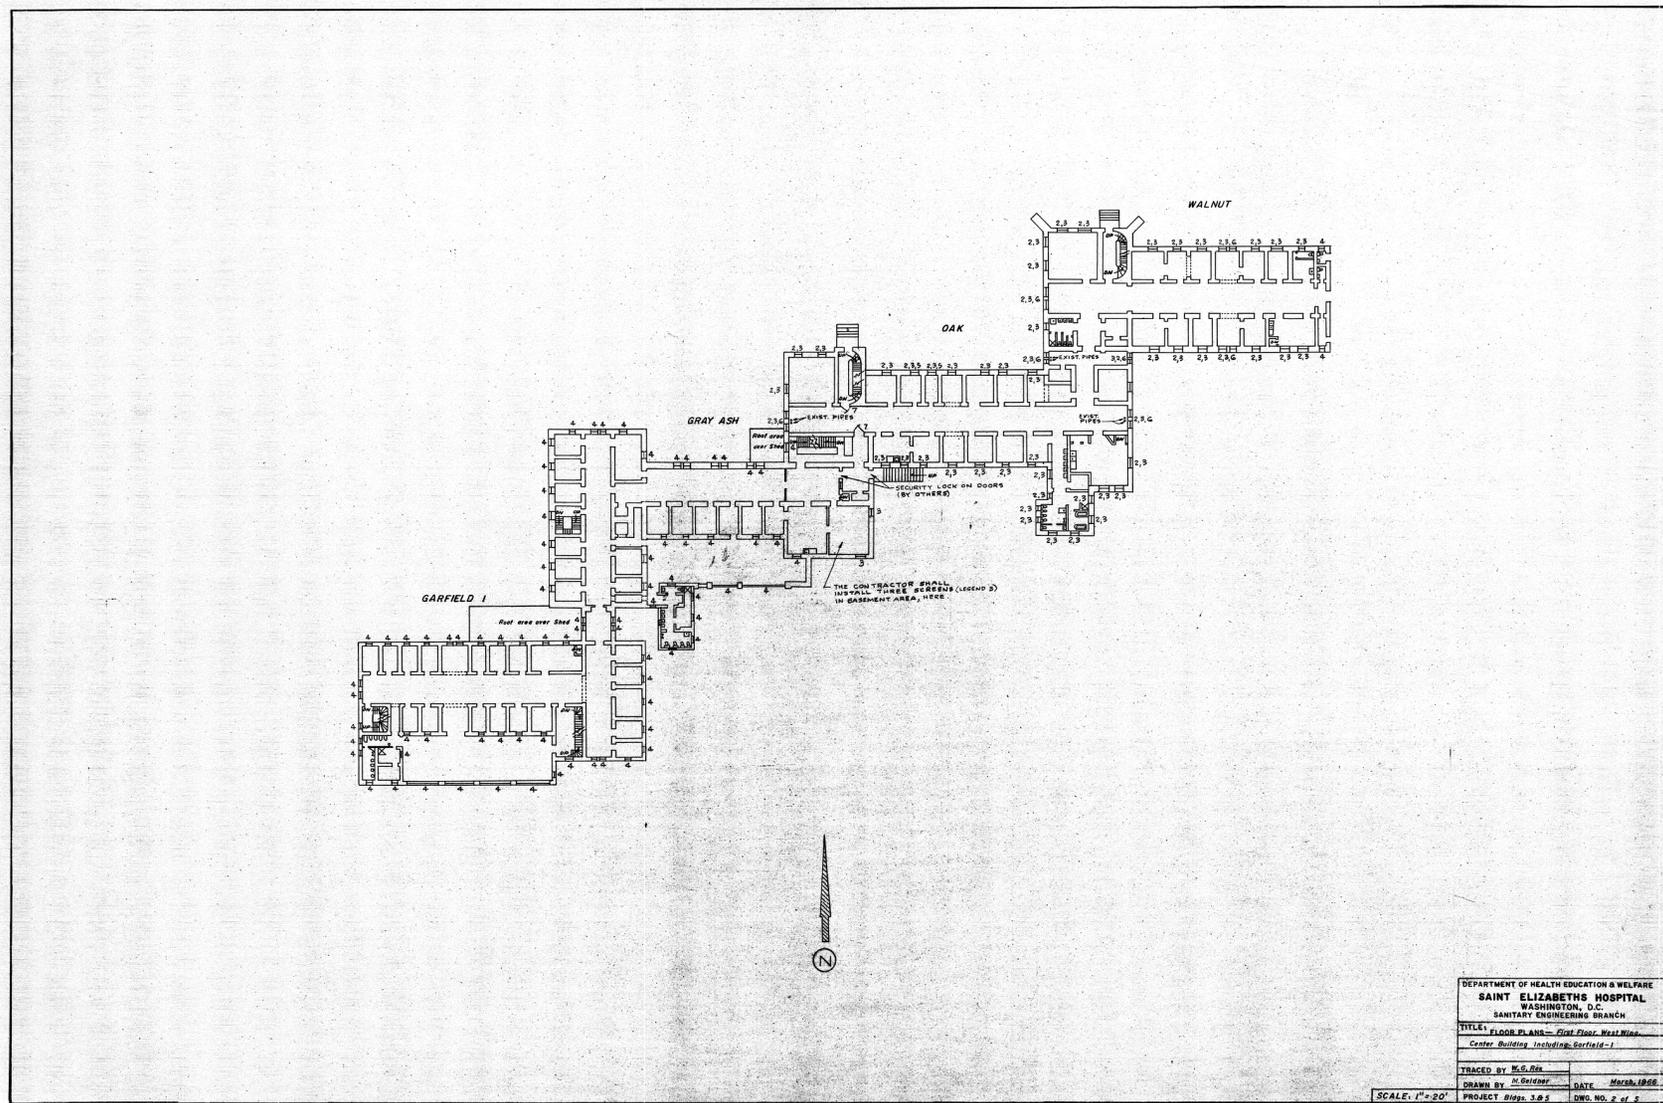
First floor plan of the West Wing, Oak and Gray Ash wards, 1966. Source: GSA archives, image DC0070SE0108.
